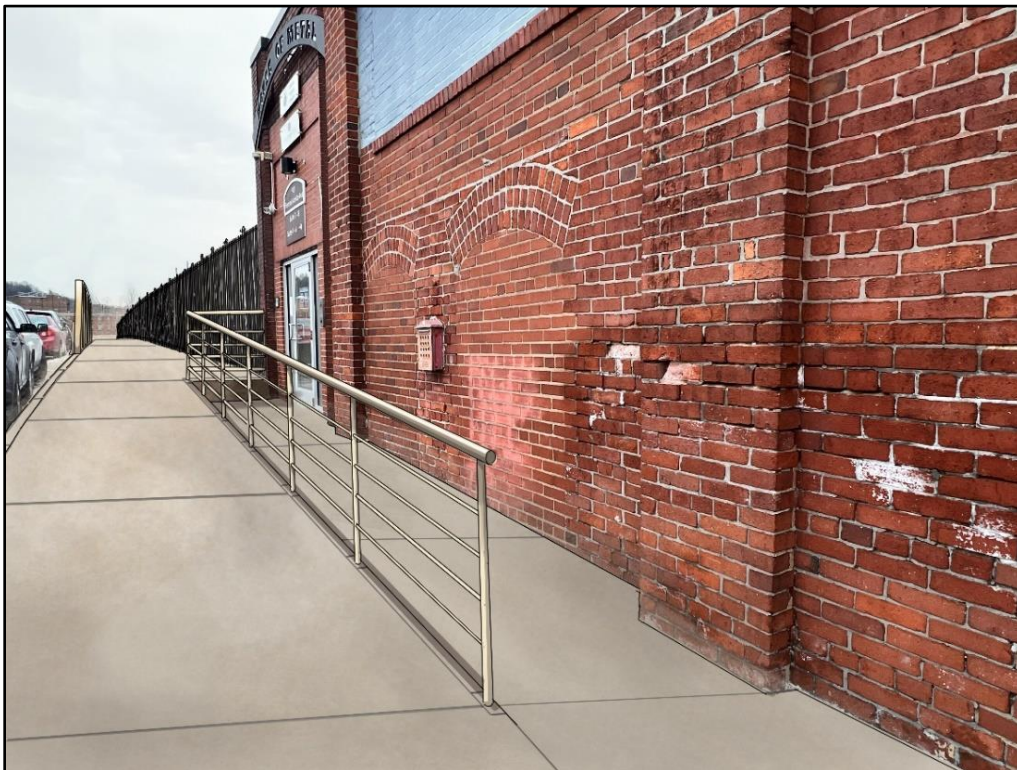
Rendering of proposed sidewalk modifications showing bifurcated sidewalk with ramp to 901 Pennsylvania Avenue, facing northeast.
